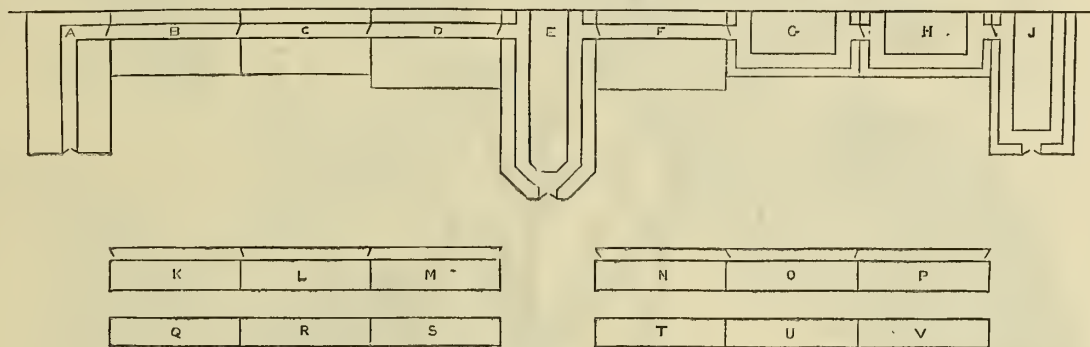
BLOCK PLAN OF LARGE COMBINATION OF HOUSES AND PITS.
